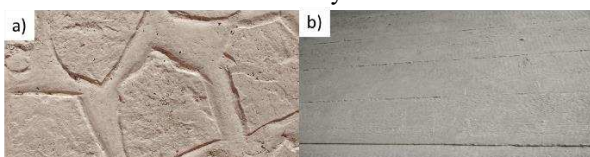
The view of the as-cast concrete surfaces of the hydroelectric dam (a) ceiling in football stadium (b).
